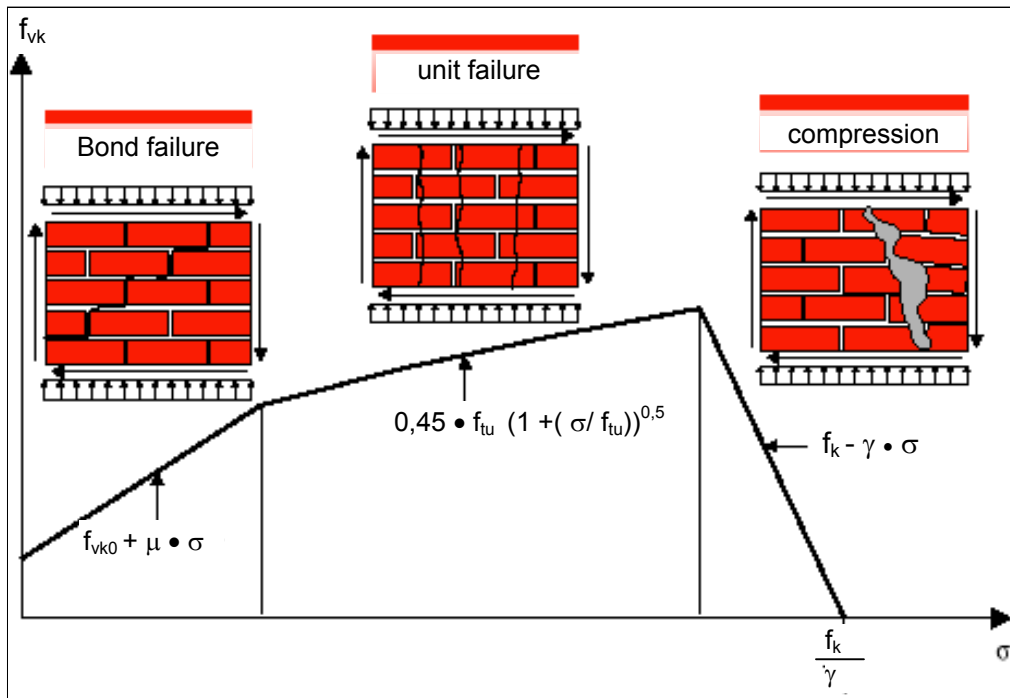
Failure modes for in plane laterally loaded masonry walls (Mann/Müller 1982)
